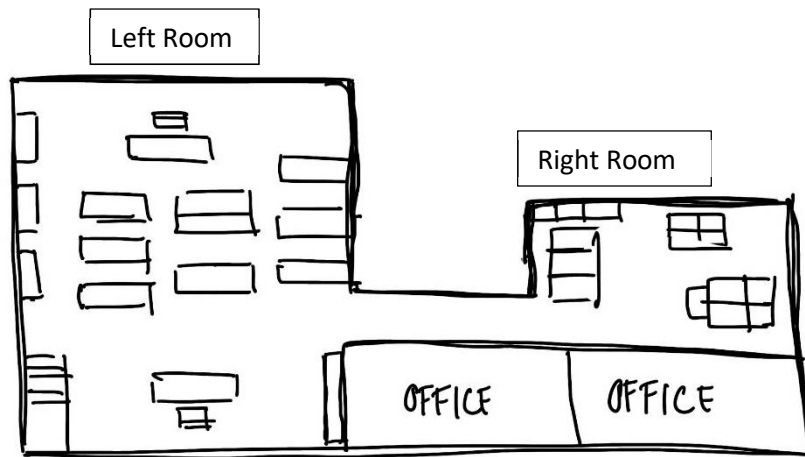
SCHOOL A PROJECT SPACE FLOOR PLAN
